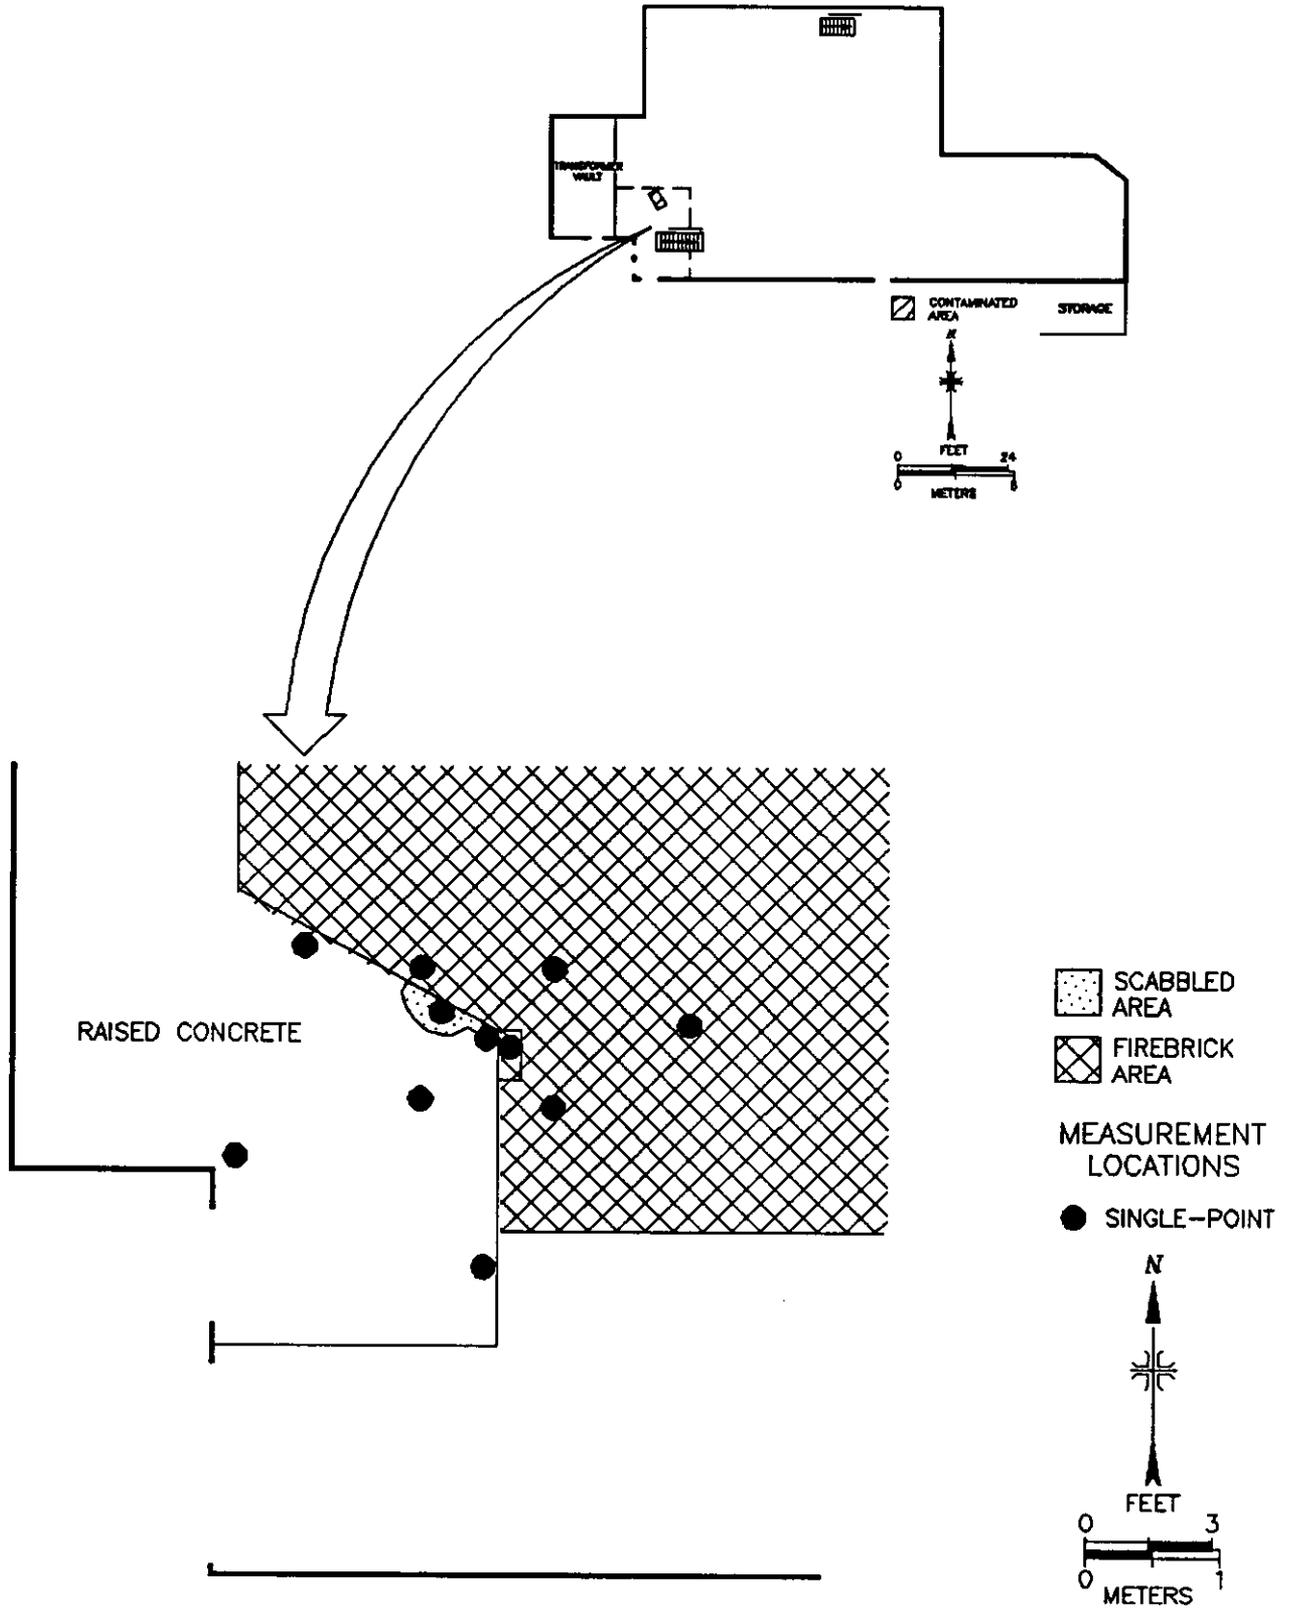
Building 25, First Floor, Indicating Measurement Locations on the Floor in the Southwest Corner
